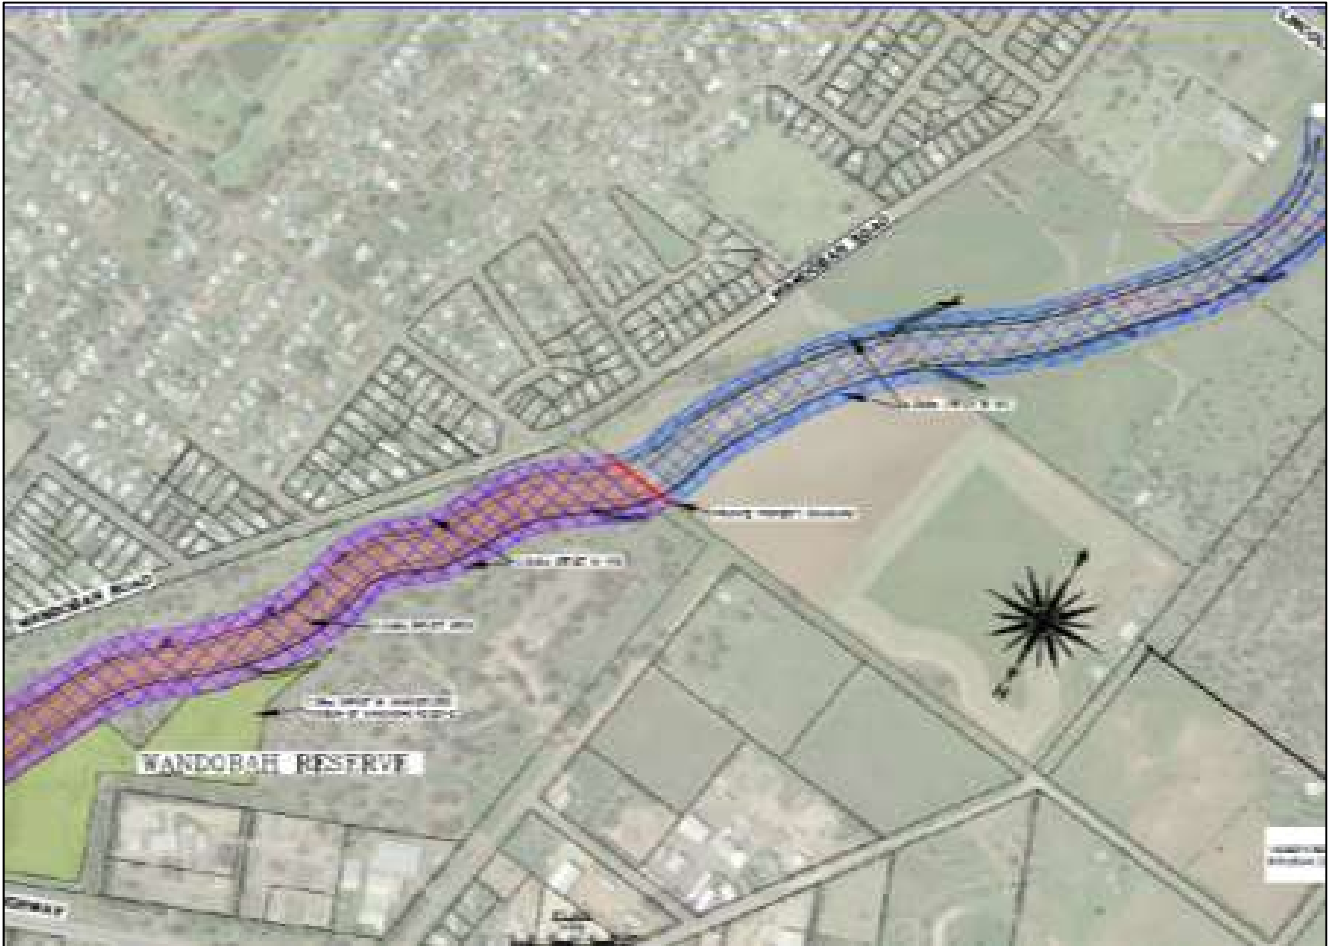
Black Jack Creek Flood Mitigation Project Plan
